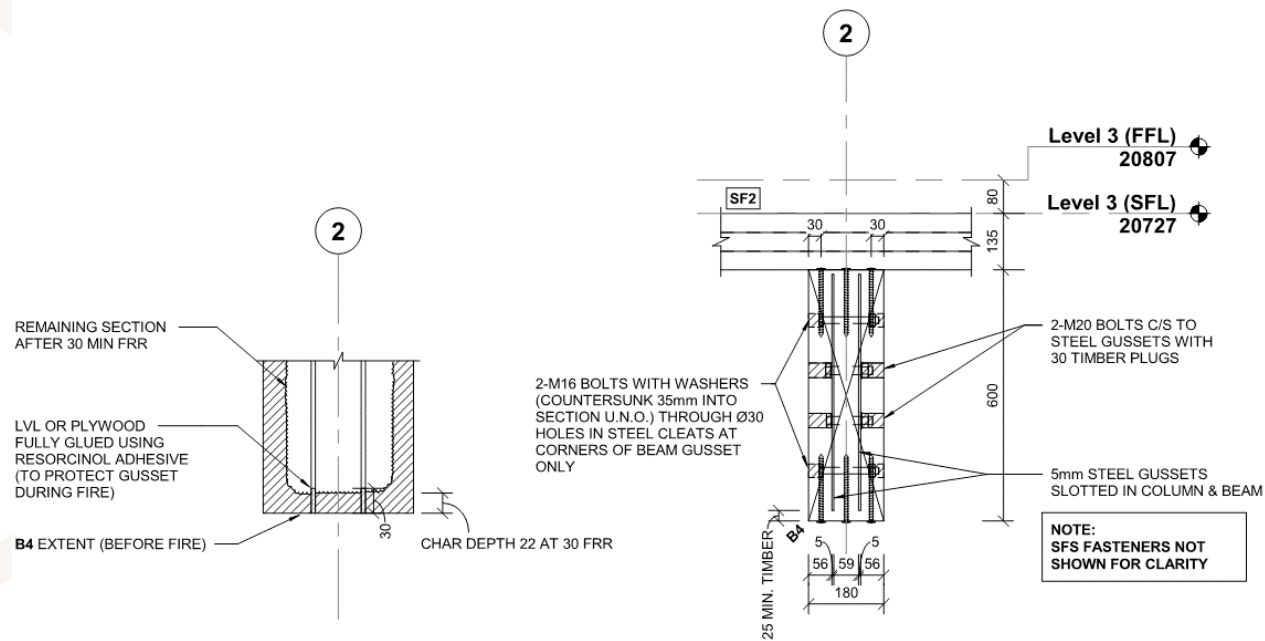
Char depth of timber beam shown for 30 minutes of fire, and cross section of LVL portal beam detail
